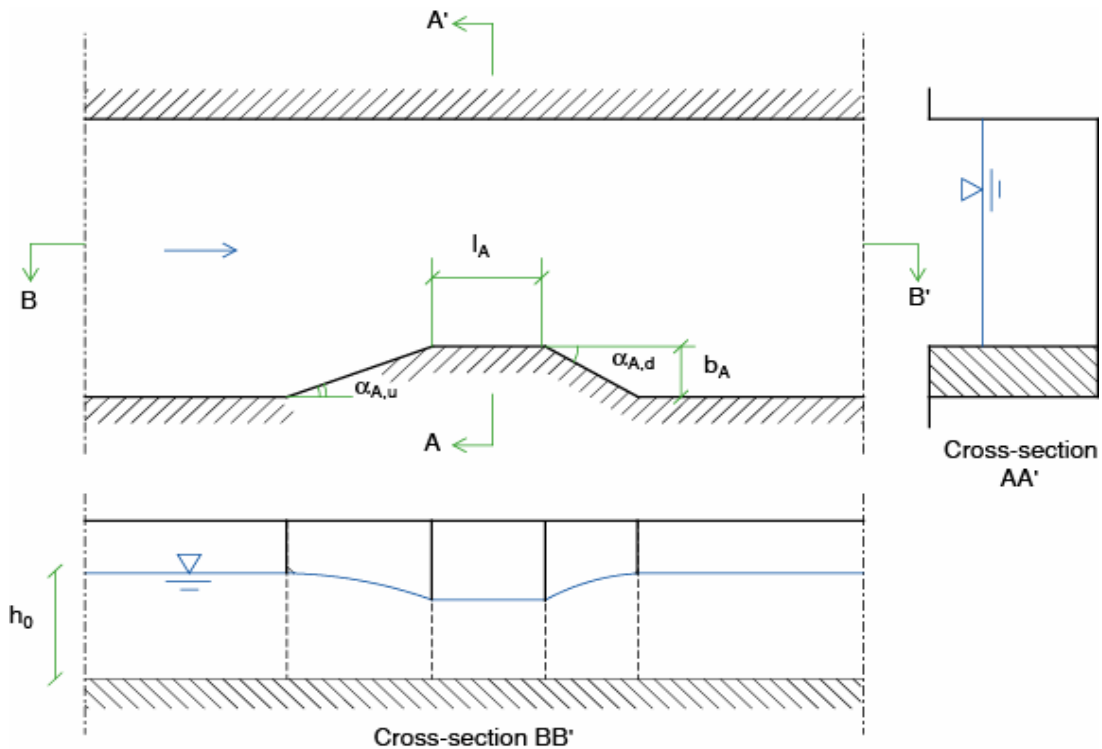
Geometrical sketch for wing-wall abutments.
